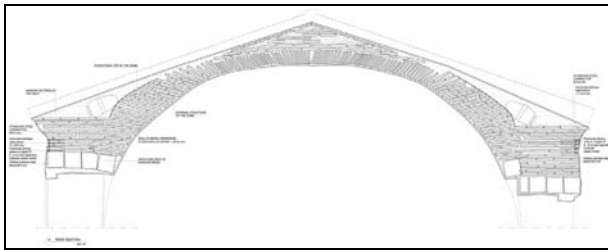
Masonry study in order to determinate steel strands layout and to ensure the correct knit dimension and shape - Section
